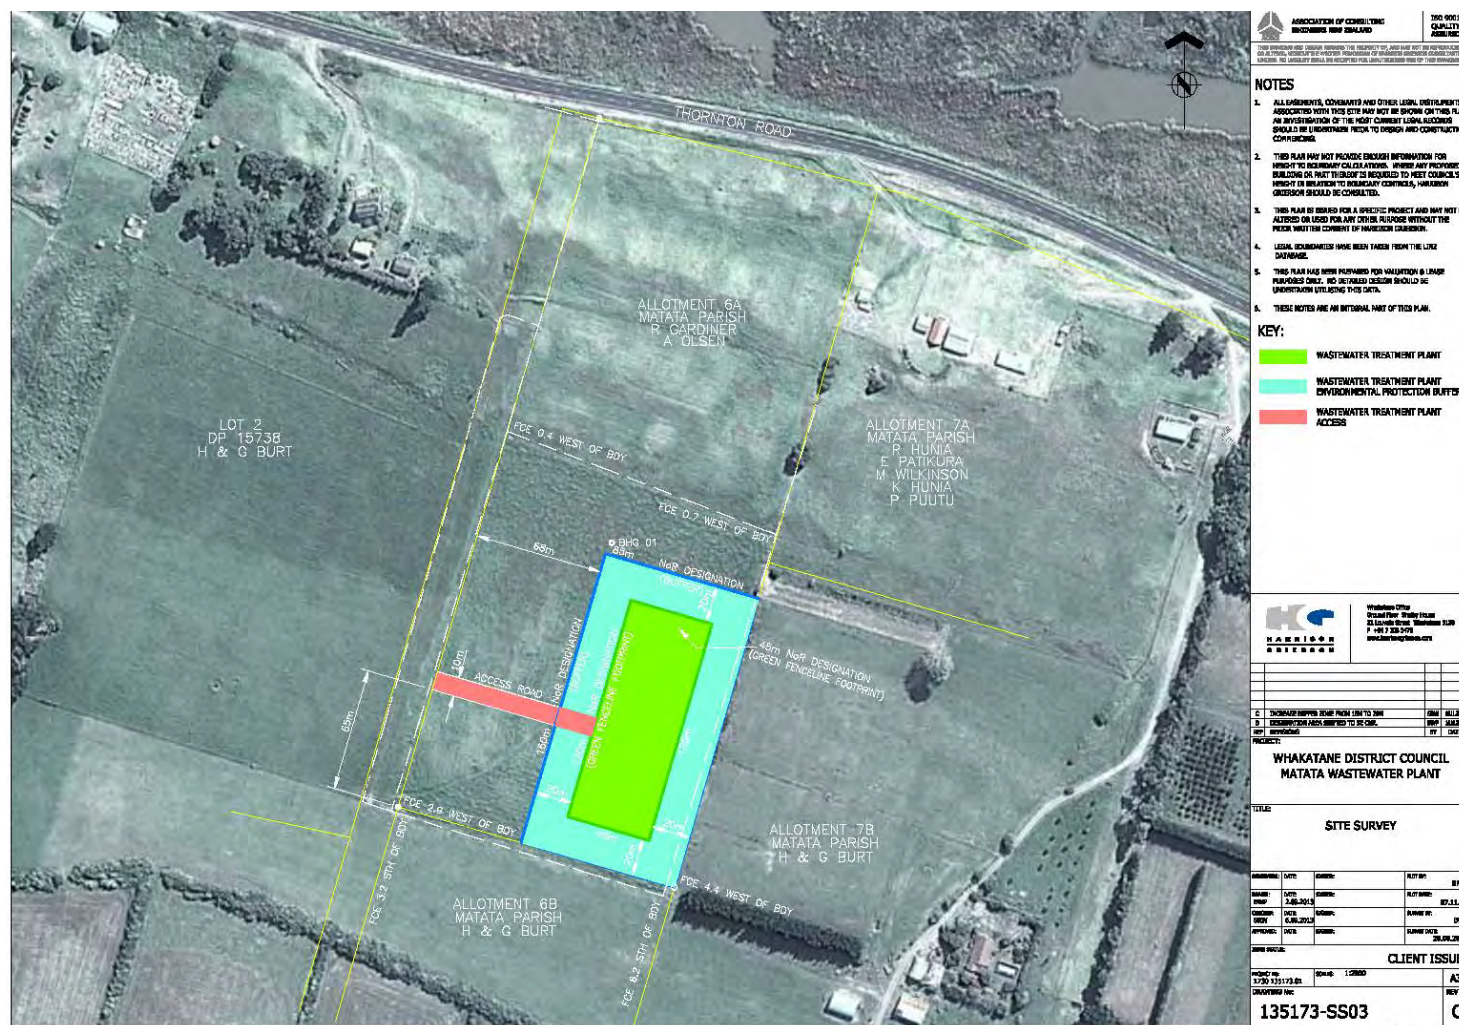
Plan View of NoR Designation of WWTP Site and Access Road
